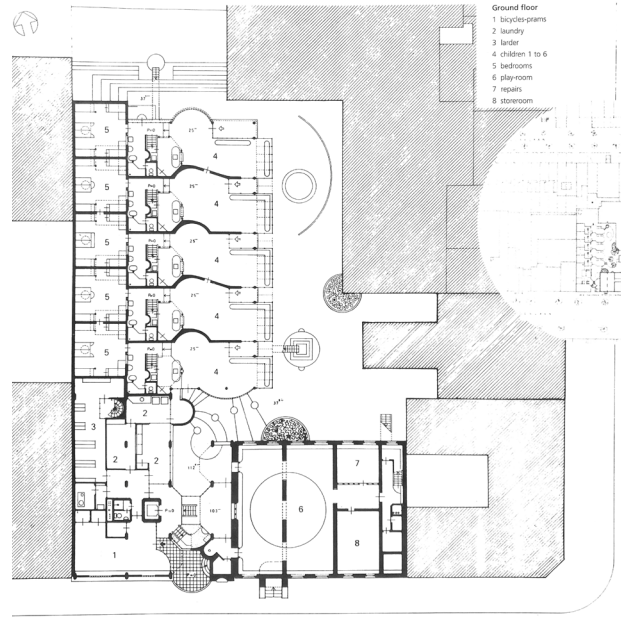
Plan ground floor (van Eyck, n.d.-d, p. 190)
